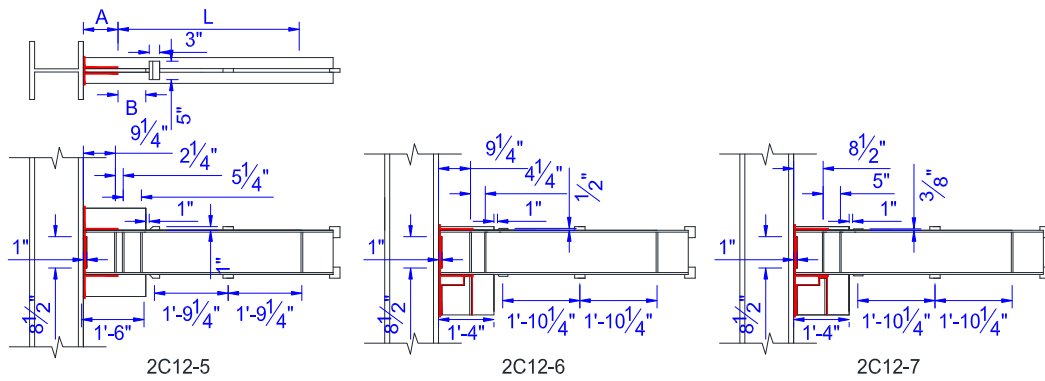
Dimensional Details of Specimens 2C12-5, 2C12-6, and 2C12-7
